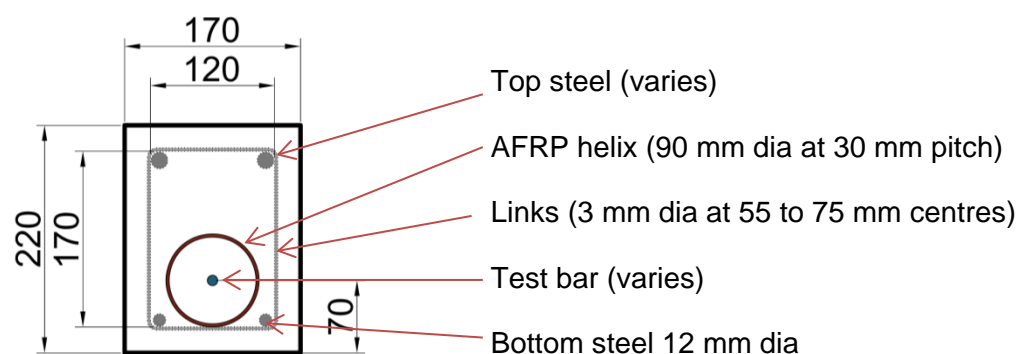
Constant hinged-beam cross section (all dimensions are in mm)
